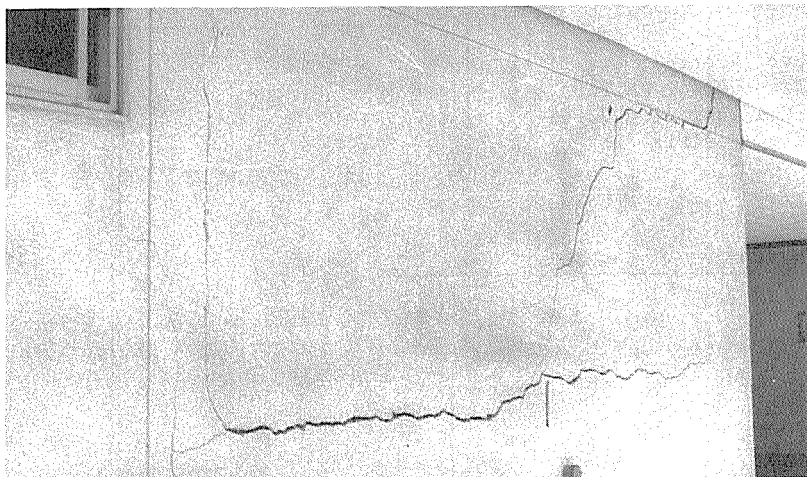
Cracks in the First Floor Walls in ENV and HSD Building
